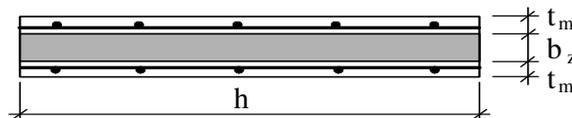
Horizontal active section of the wall (Ex.Figure 19 -  $h=257$  cm;  $b_z= 28$  cm;  $t_m=6$  cm)
